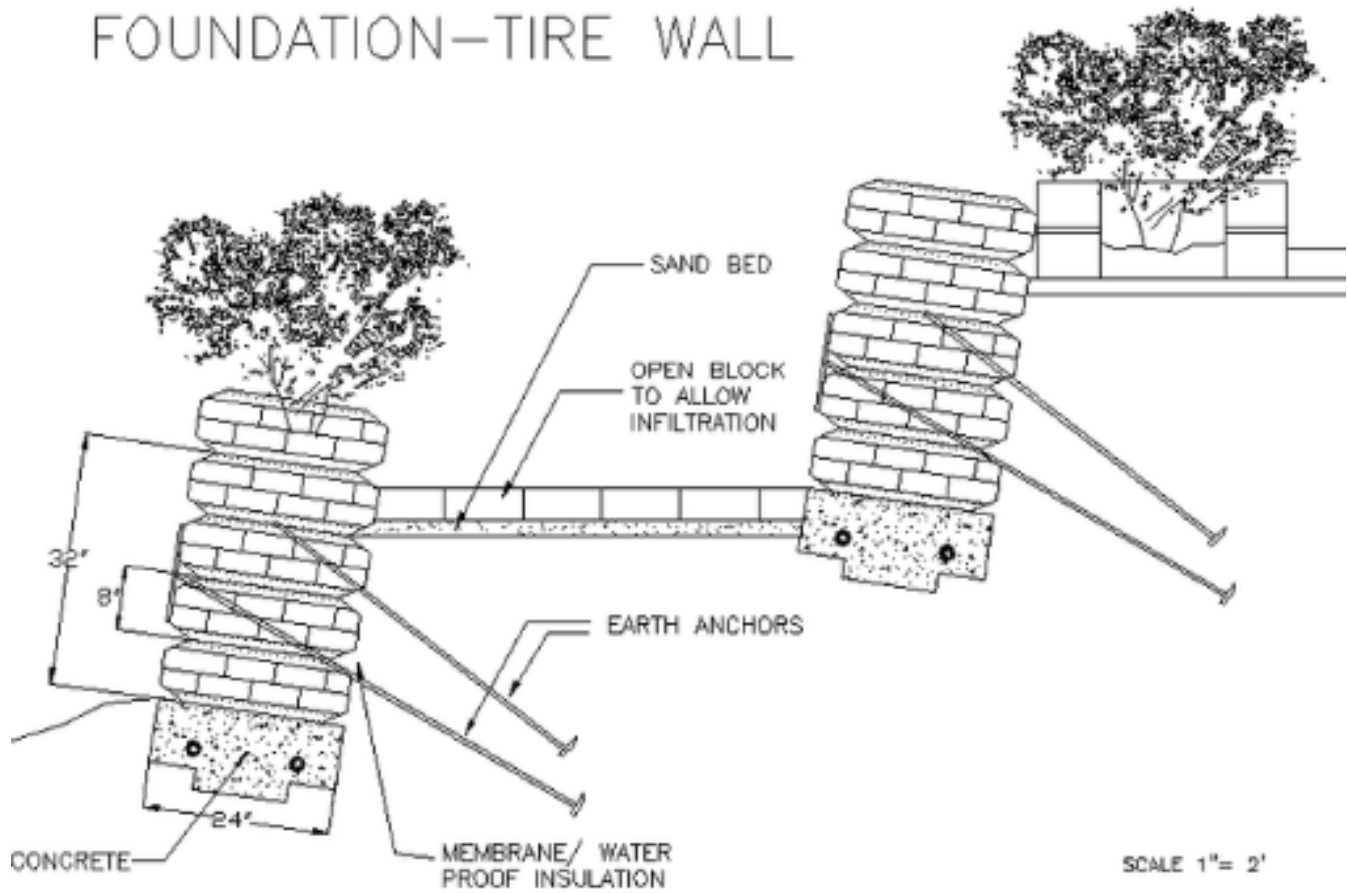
Diagram of tire stacking and reinforcement option using rope earth anchors and concrete (Slack et al. 2018).
